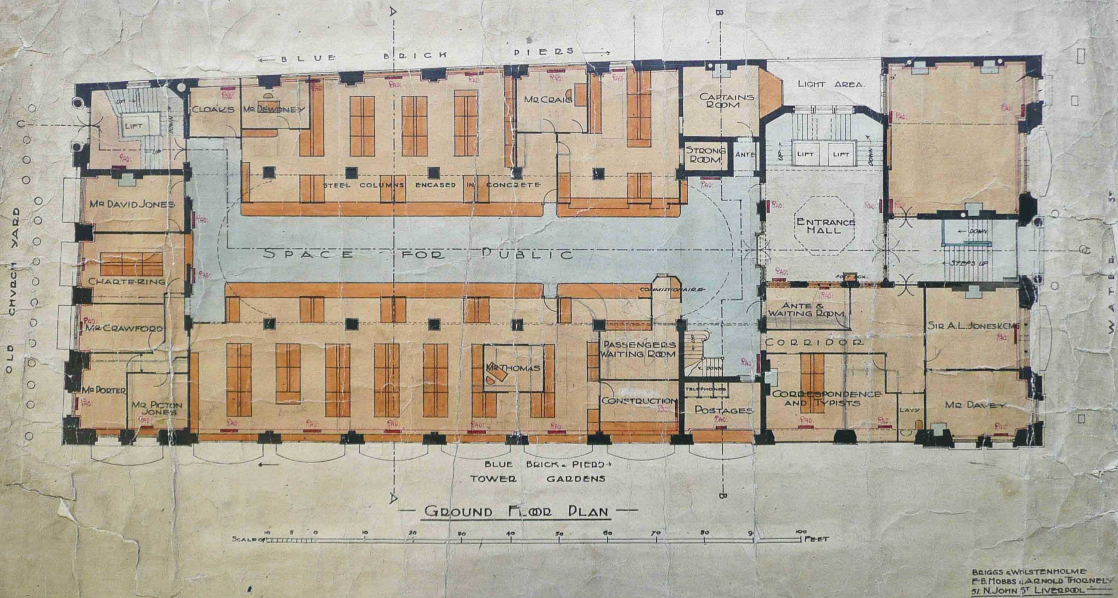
Architects' ground floor plan of Colonial House. On the right (facing Water Street) are the offices of Alfred Jones and William Davey; on the left (facing St Nicholas Church Yard) are those of David Jones and Alfred Crawford; at the top is the office of John Craig (taken into partnership shortly after the plans were drawn). Courtesy LRO.
